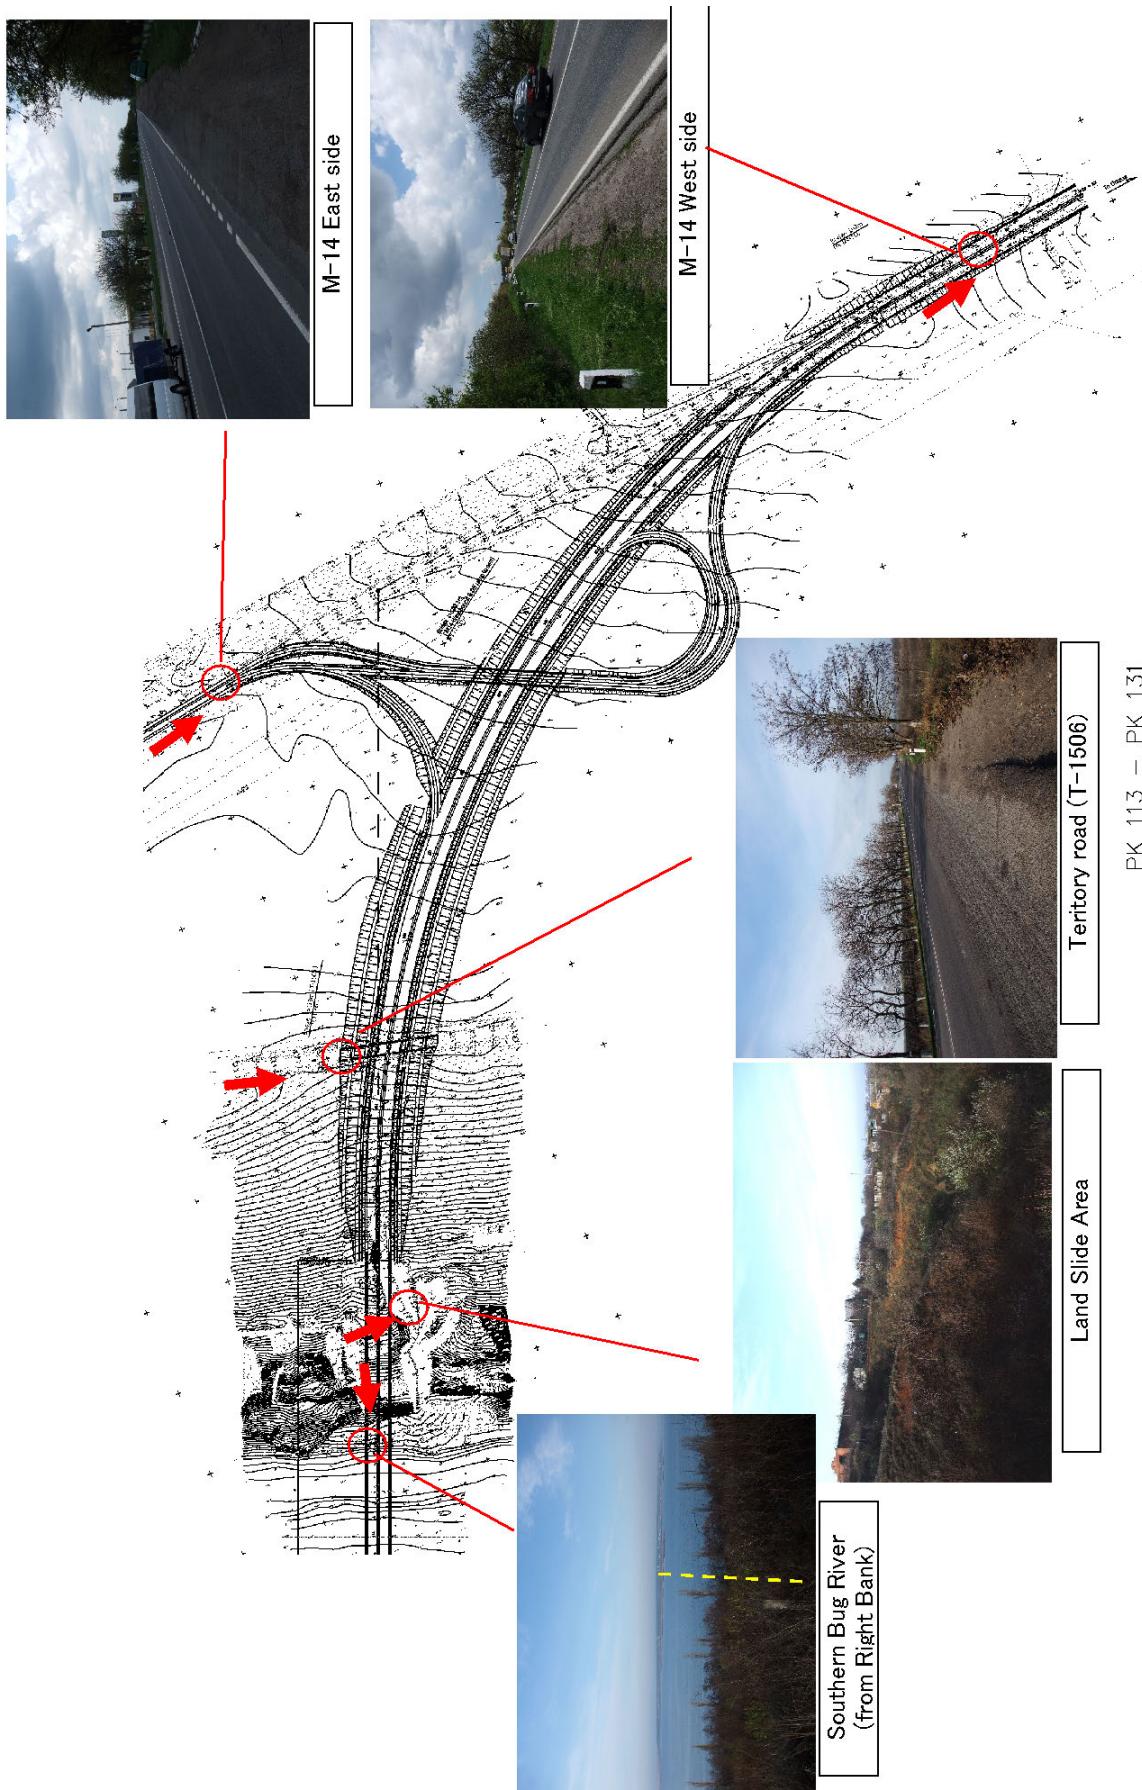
Current Site Condition of M-14 Bypass Road (4)
